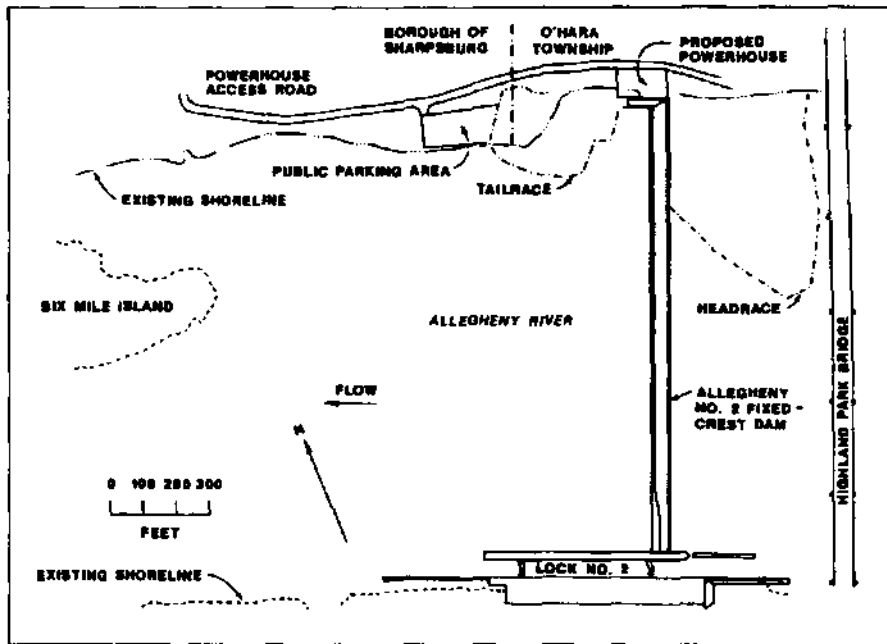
Layout diagram for the Allegheny Lock and Dam No. 2 Project (FERC No. 4017). Source: Modified from Exhibit F, City of Pittsburgh, 1984.
